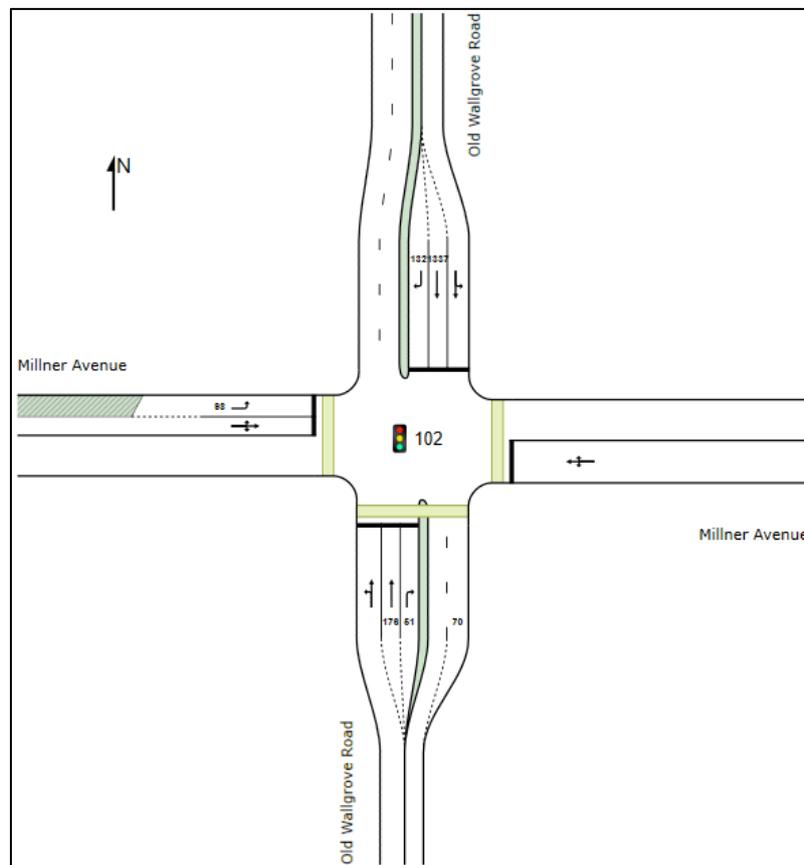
SIDRA Existing Intersection Layout – Millner Ave / Old Wallgrove Rd
